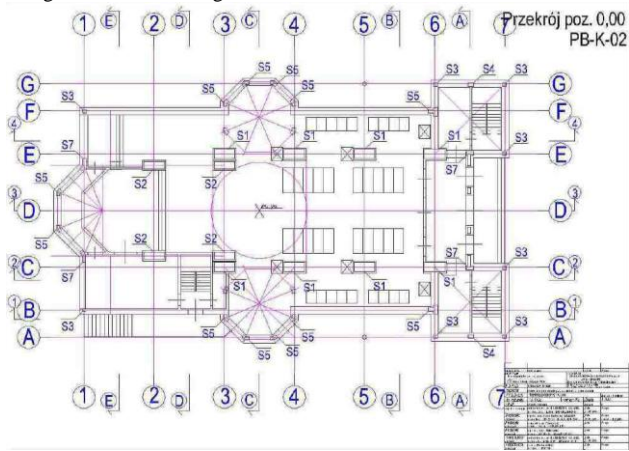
Ground level, A2, with location of reinforced-concrete columns.
